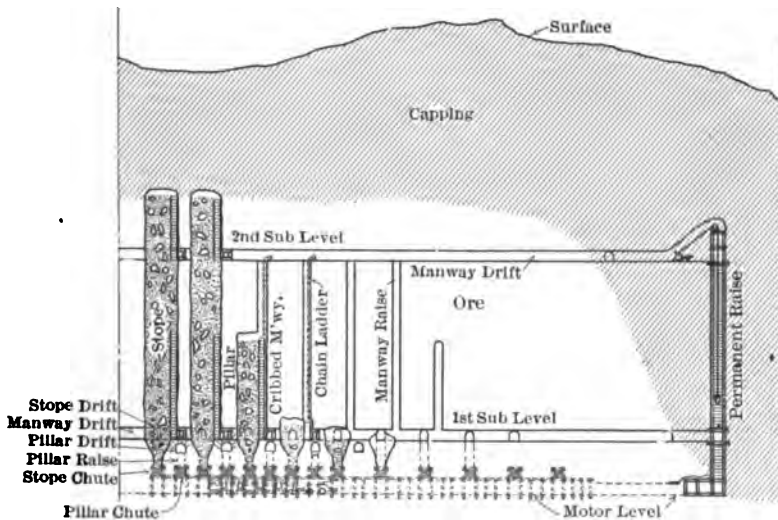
D.—CROSS-SECTION SHOWING SHRINKAGE STOPES AND PILLARS.
